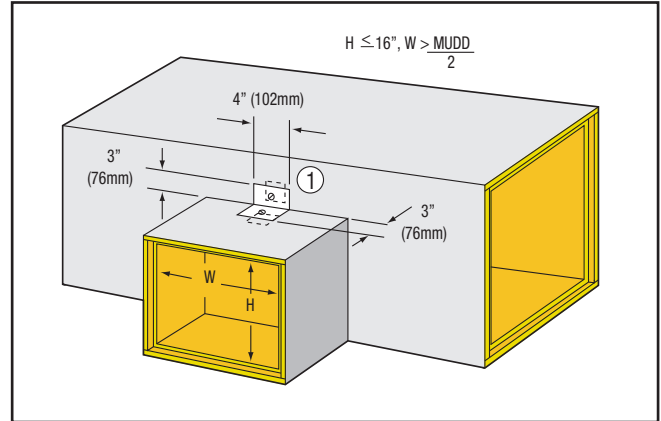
B. Sheet Metal Angle Reinforcement, Sides of Branch
